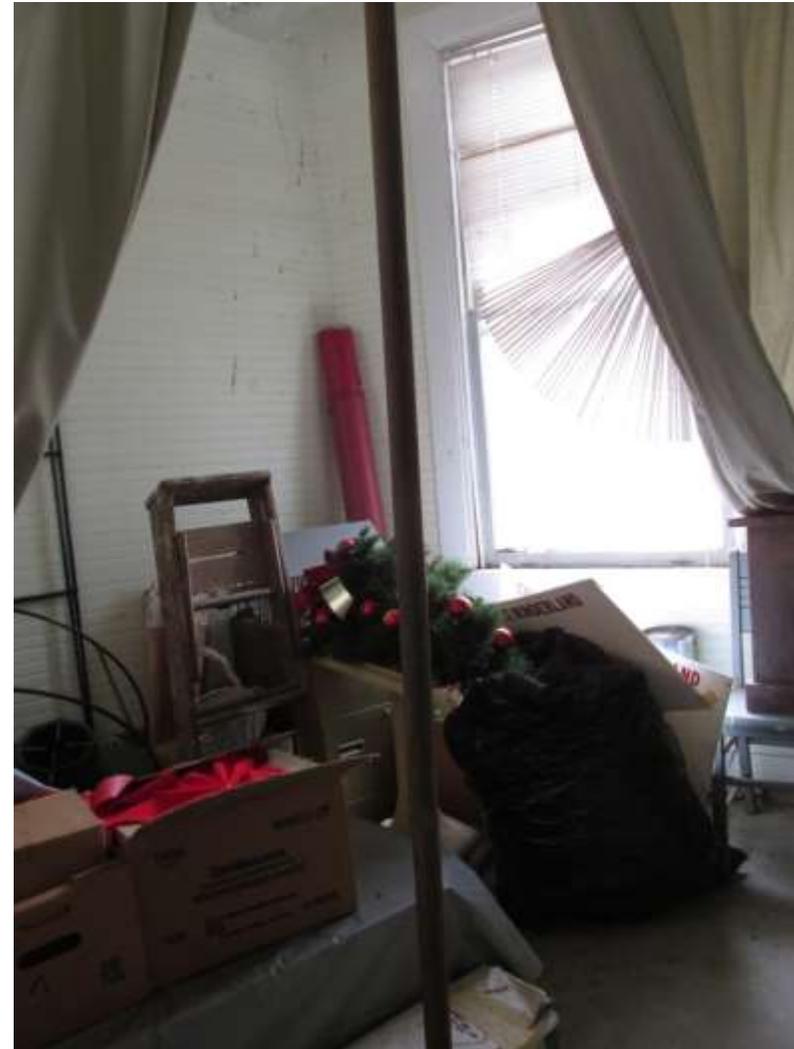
Current lower level restroom. The restroom should be relocated to the bay window area on this floor and this area used as part of the proposed event room.
